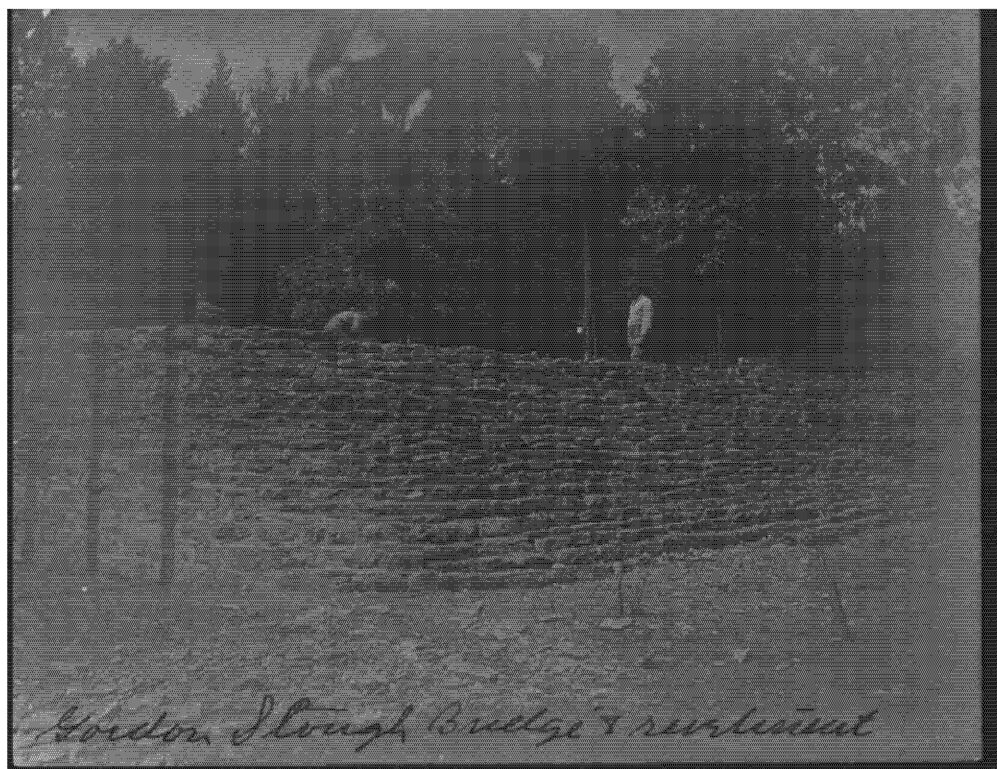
View of Gordon's Slough Bridge and Connecting Roadway.
